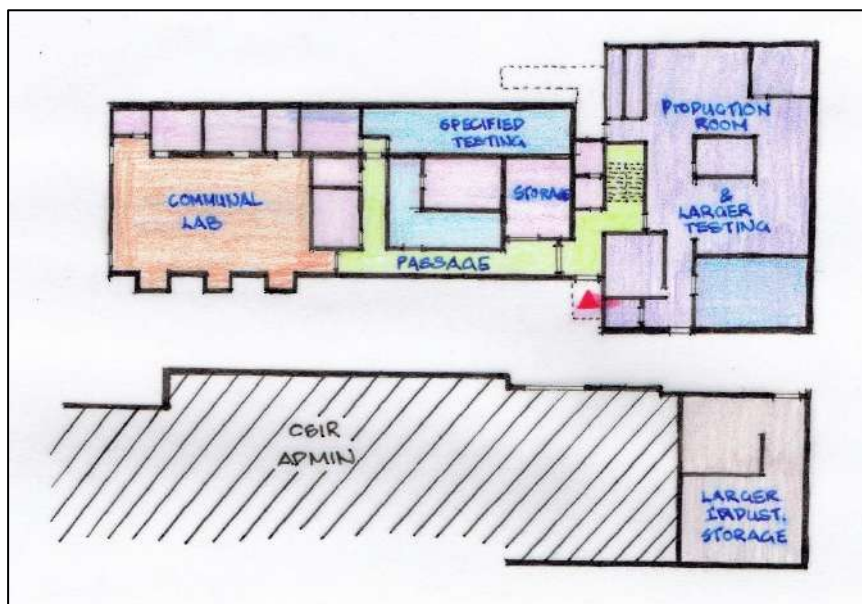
This storage space holds large machinery or prototype testing equipment before they are ready to be up-scaled for industrial use
